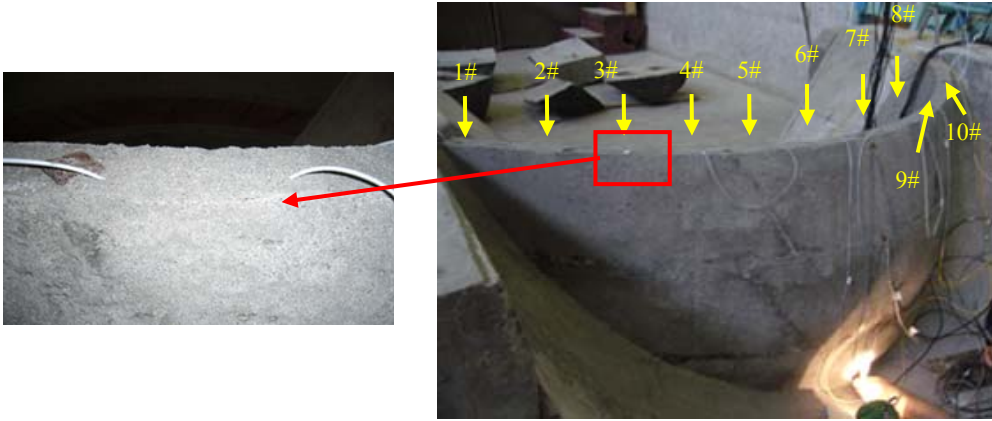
Positions of FBG sensors and the partial enlarged drawing after installation
